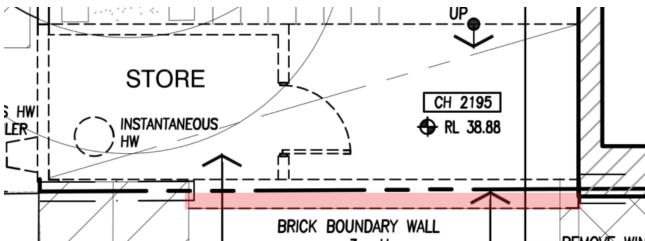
Existing ground floor plan showing extent of the existing southern boundary wall constructed over the title boundary (highlighted in red).
